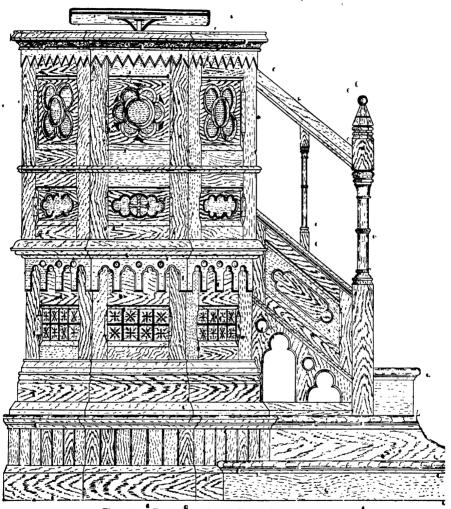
Front Elevation of Pulpit (from Church Floor).
